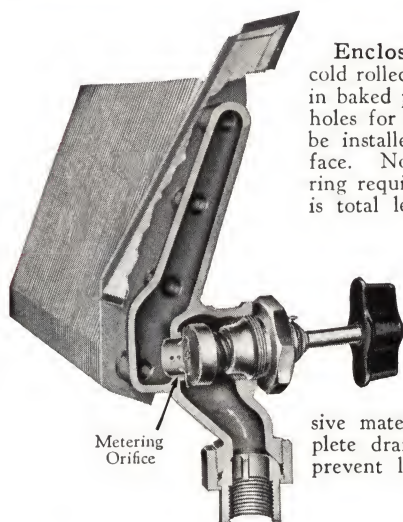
Cut-away View of Supply Header Showing Webster "Three-Point" Valve including metering orifice
